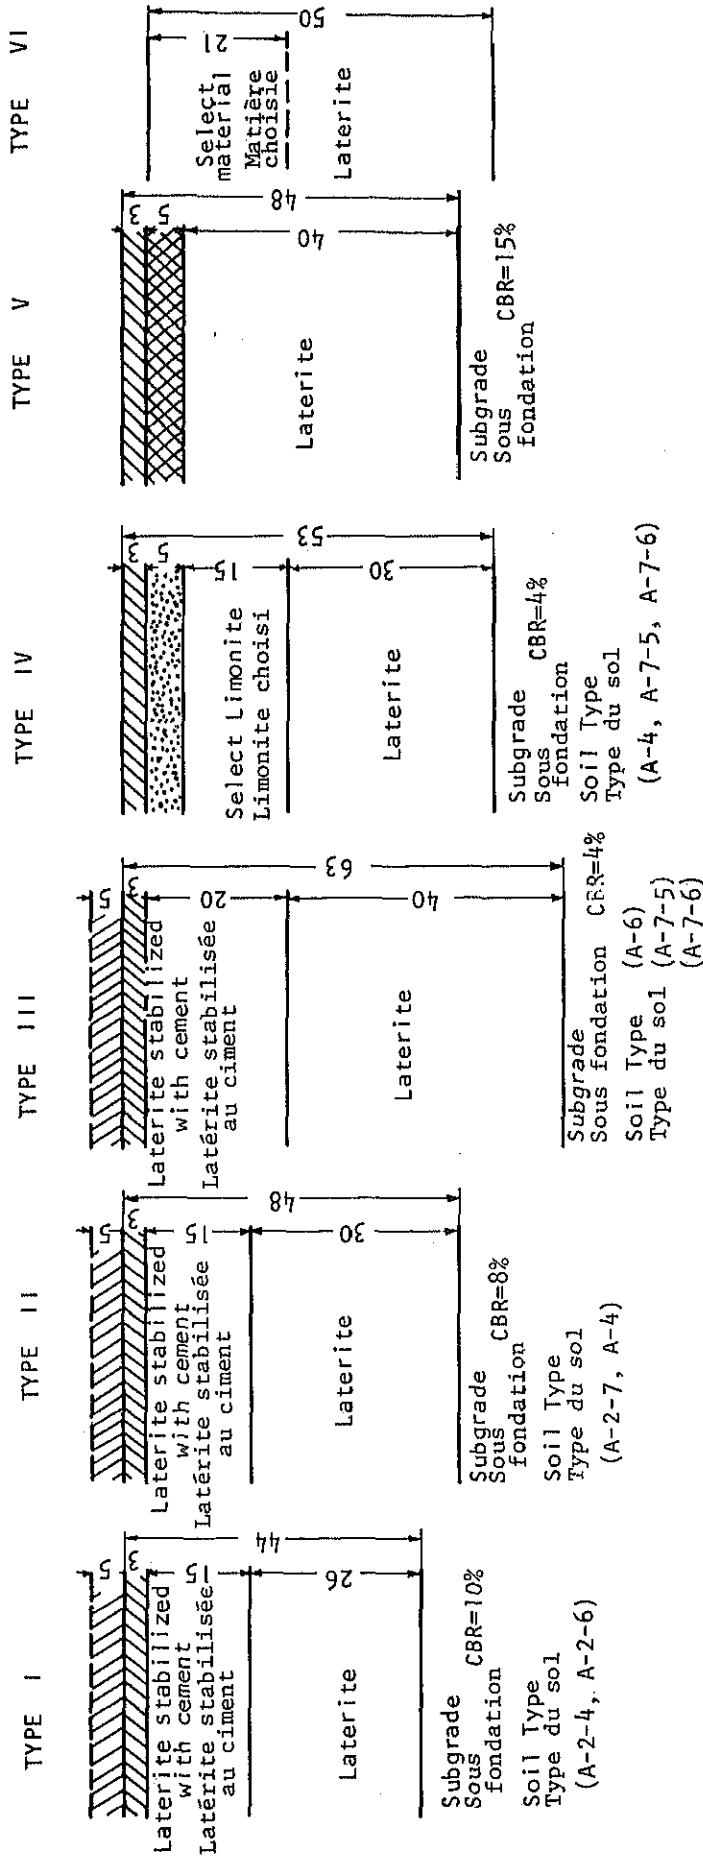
TYPICAL SECTIONS OF PAVEMENT
